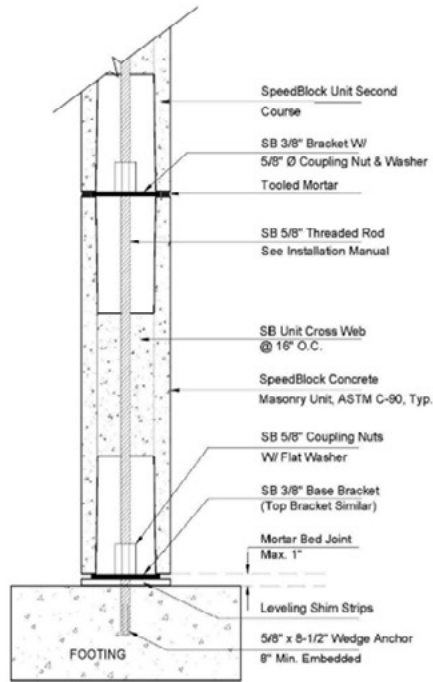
INSTALLATION DETAIL (1 in.=25.4 mm)
